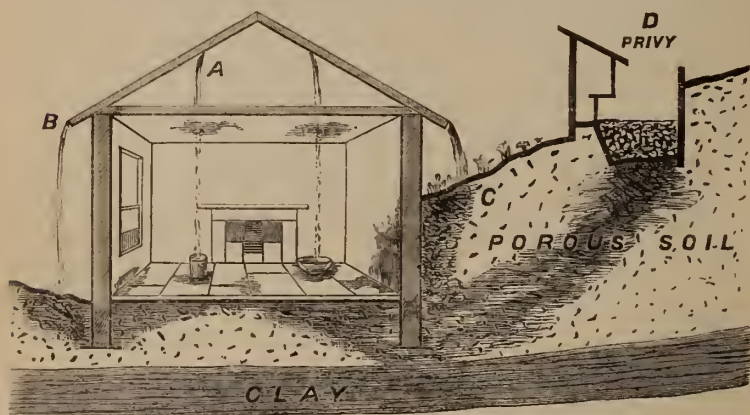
Cottage, damp from A, roof leaking into ceiling; B, ungluttered eaves; C, soil against outer wall, wet with soakings from garden and privy midden; D, privy midden above level of ground floor.
